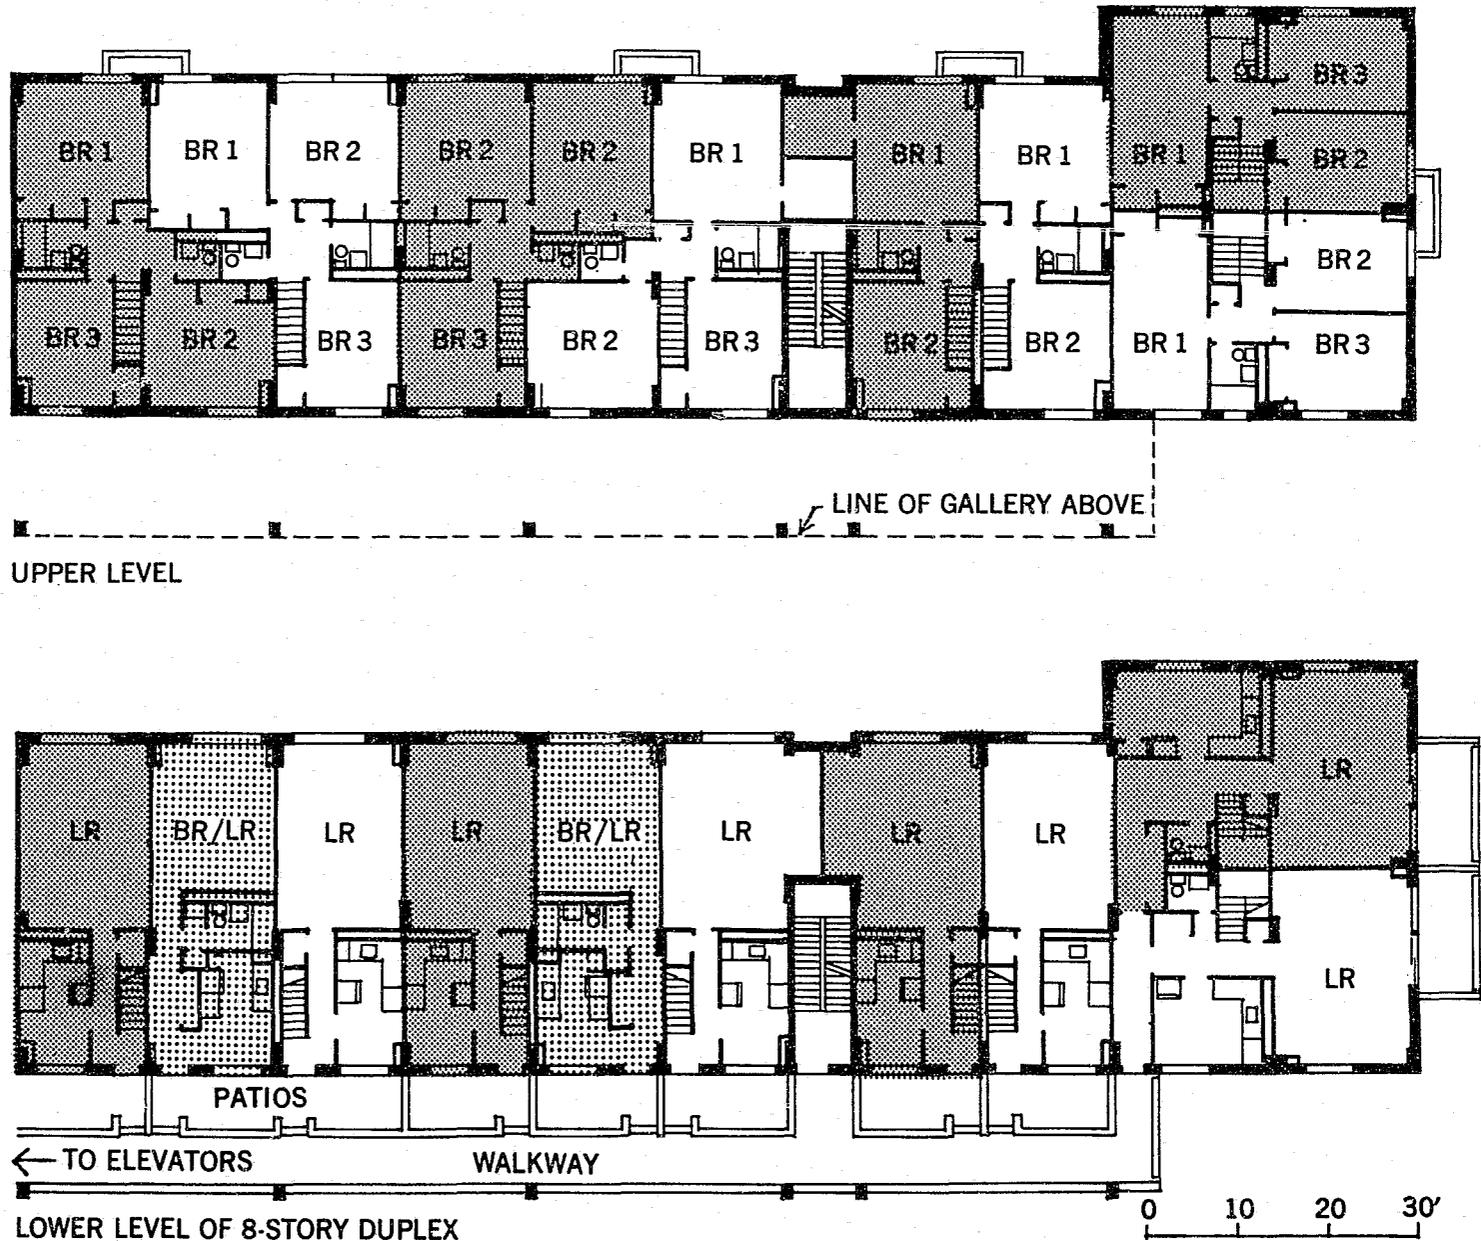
Riverbend Houses, New York. Floor plan.
